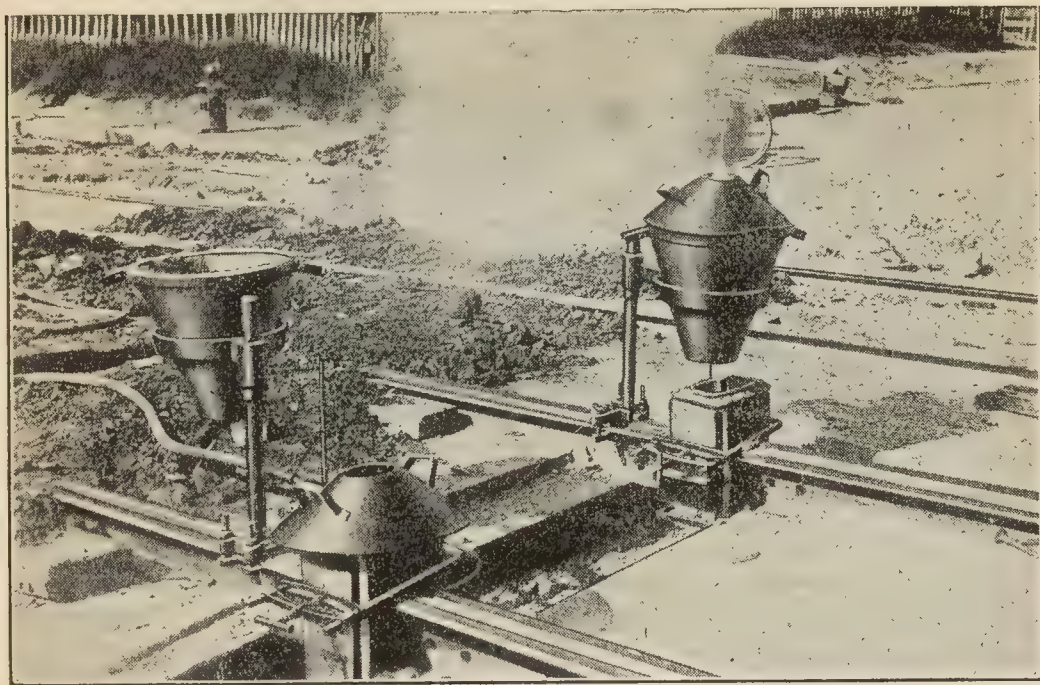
,021.—Open mould and crucible in position for making Clark thermit rail joint. In its original form the Clark joint consisted of a combination of splice bar and thermit steel, it being Mr. Clark's opinion that the head of the rail could be supported by using plates that would come under the ball of the rail. Furthermore, in order to hold the rail rigid, he considered it important that there should be no play in the bolts, so the holes in the plates and rails were drilled round and machine bolts used after reaming for a drive fit. In order to keep the bolts and plates from working loose, and to afford bonding between the rails, a thermit steel shoe was cast around the base. *In practice*, the rails and splice bars are drilled with holes $\frac{1}{16}$ of an inch less in diameter than the bolt to be used. The splice bar is then applied in the ordinary way and held in place by a couple of temporary bolts, a drift pin being driven into one hole each side of the joint to keep the rails in position. The remaining holes are then reamed with straight end cutting reamers, after which the machined bolts are driven and tightened up in the usual manner. After pre-heating the rail ends, the thermit steel is run into an open mould surrounding the lower part of the rails. In the latest type of Clark joint, rivets are substituted for the machined bolts, the riveting being accomplished by a pneumatic riveter mounted on a flat car manipulated by means of a small derrick. A modification of the Clark joint has recently been adopted by the United Railways & Electric Co., of Baltimore. The object of the modification was to obtain a larger weld of the base, and in order to do this, the thermit steel was poured into an enclosed mould box instead of into an open mould and the rail ends were preheated to a red heat with the moulds in place before the thermit charge was ignited. Furthermore the design of the fish plates is somewhat changed, being of special design, one inch thick and 32 inches long and so formed as to fit snugly the carbon of the head and base of the rail. At the same time, they provide a minimum amount of space between the web of the rail and the vertical sides of the fish plates. The channel bars and rails are of the same kind of steel (high carbon) and both are punched at the mill with ten $\frac{1}{16}$ inch holes, spaced 3 inch centers and beginning 2 inches from the end of the rail. The joint has been applied thus far exclusively to 7 inch girder groove rail weighing 103 pounds per yard. These 7 inch girders sections are undercut by the manufacturers $\frac{1}{16}$ inch so as to provide a space of $\frac{1}{8}$ inch at the base when the rail ends are butted. This procedure more effectively enables the thermit steel to weld the rail and fish plates into a solid mass at the joints.
